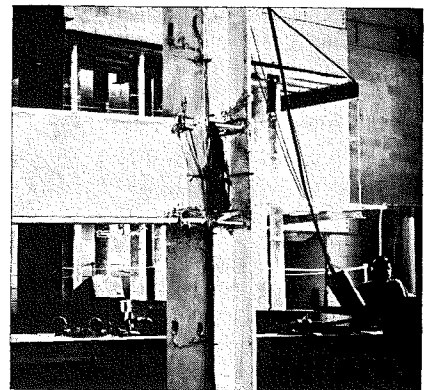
Over-all view of connection assemblage B1 before repair of stiffener cracks ($V = 149$ kips)
